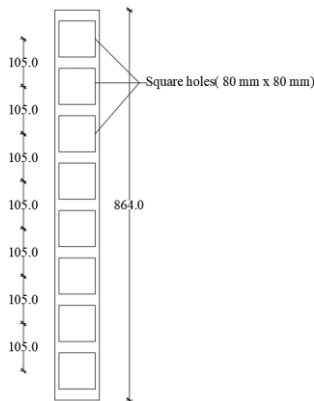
Details of holes in CFCSW1 and CFCSW2 (section B-B, units in mm)
